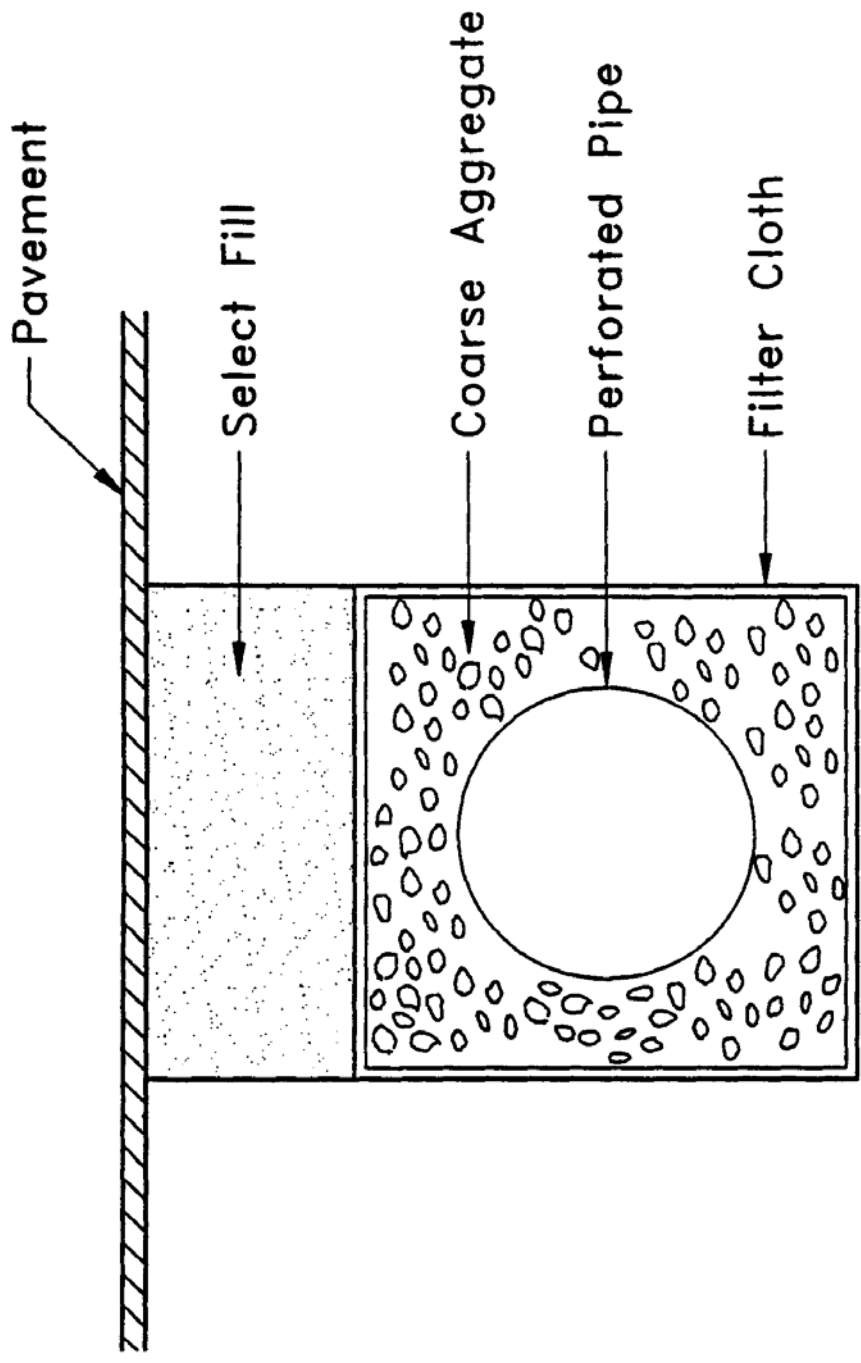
Cross-section of typical underground exfiltration trench (N.T.S.)
